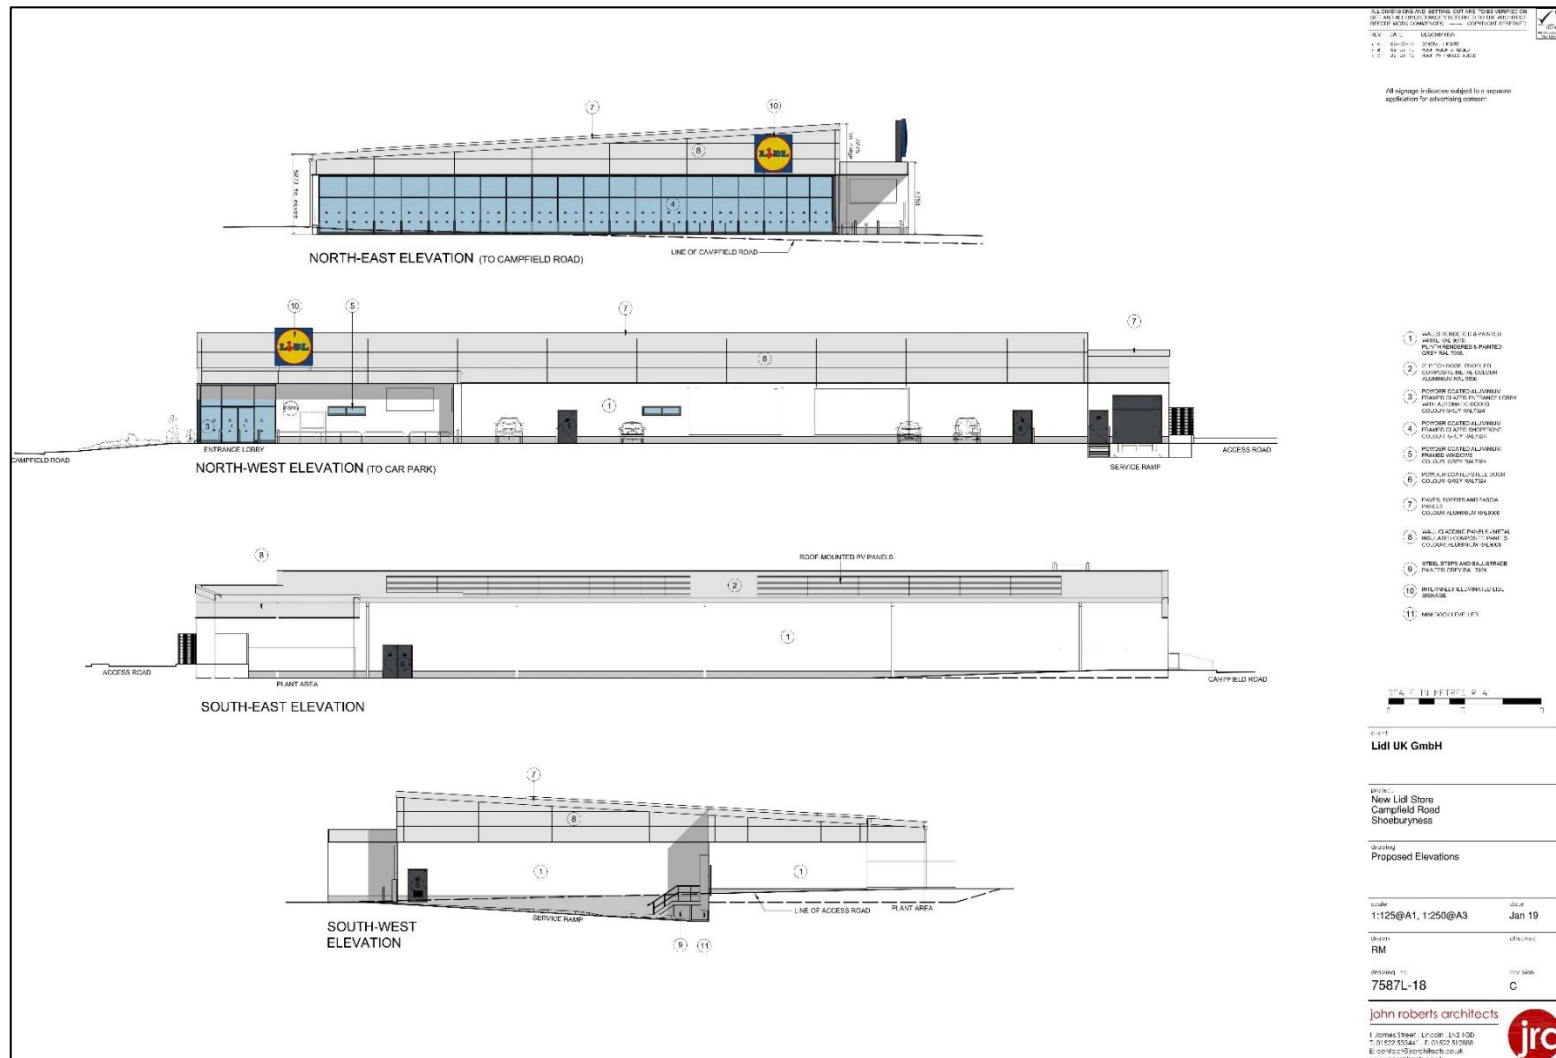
Proposed elevations (John Roberts Architects, Dwg. No. 7587L-18, rev. C, Jan 2019)
